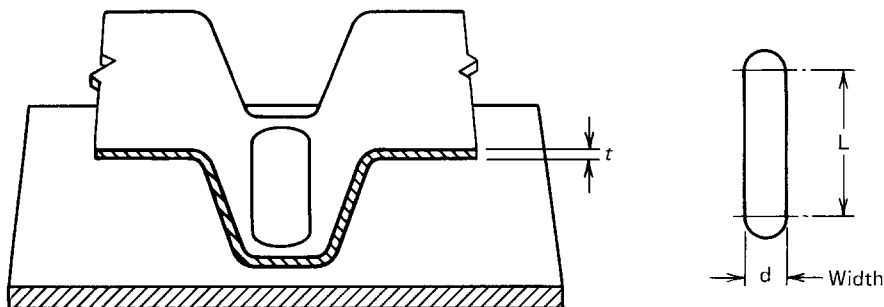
Arc seam weld joining sheet to supporting member.^{1,314}
